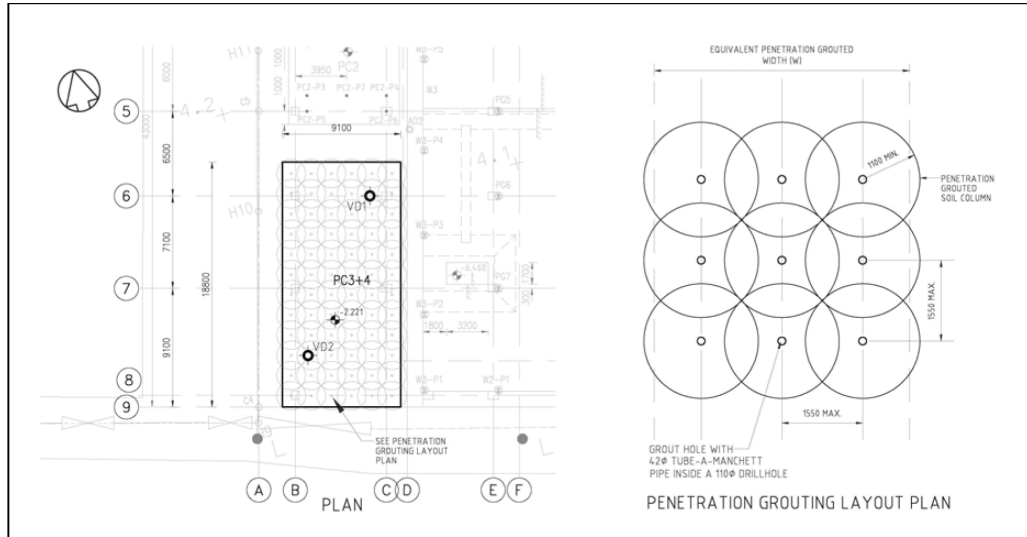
Layout Plan of Raft Foundation PC3+4 and Grouting Pattern
